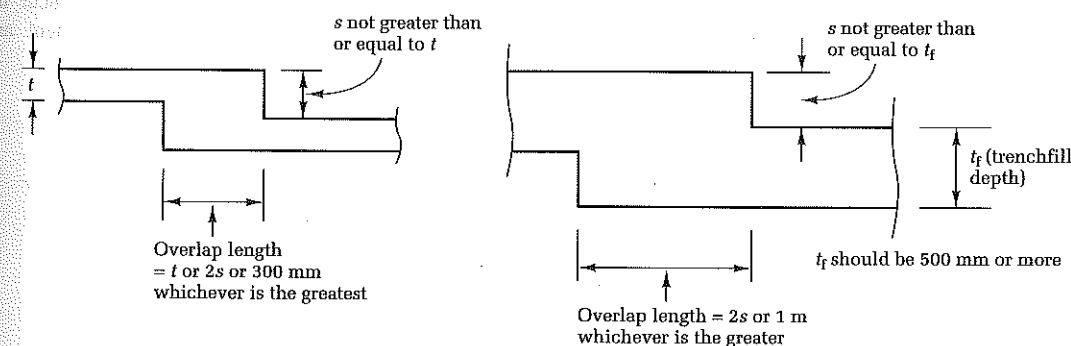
Requirements for overlapping stepped foundations. (a) Conventional strip. (b) Narrow strip (trench fill).
